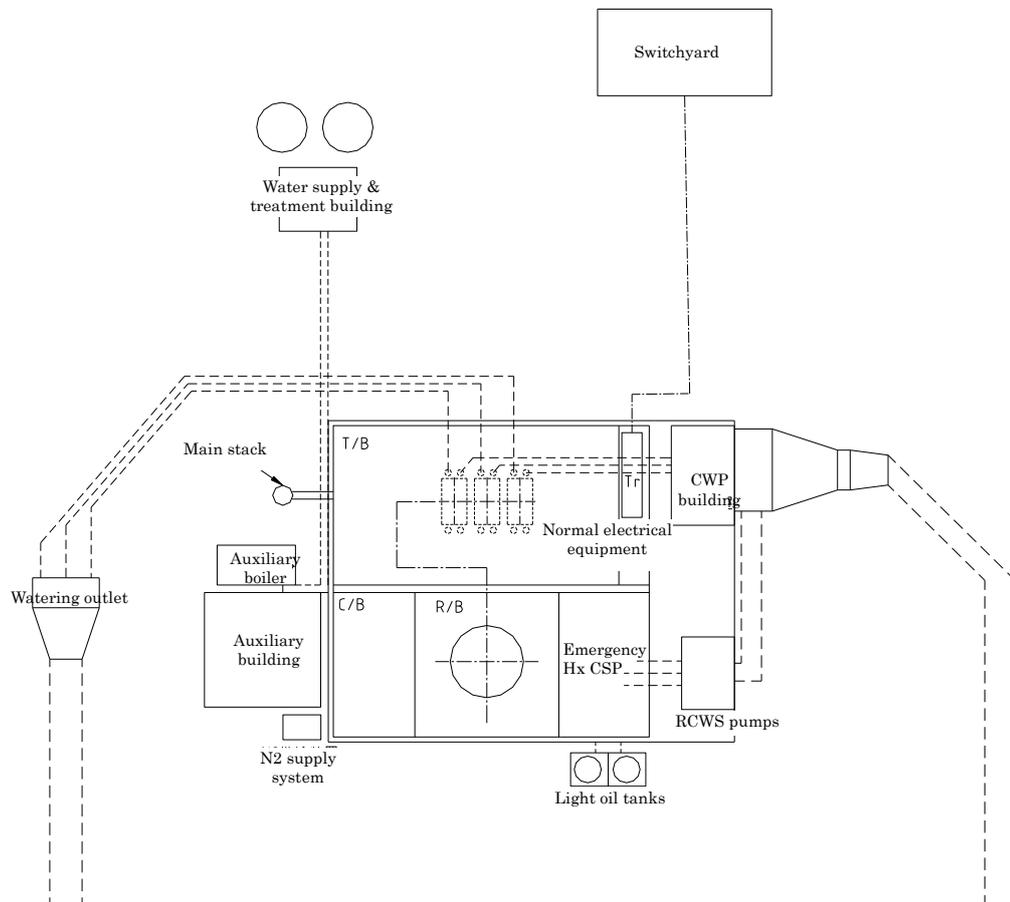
Plot plan of seismic Isolated BWR nuclear power plant for a BWR site
